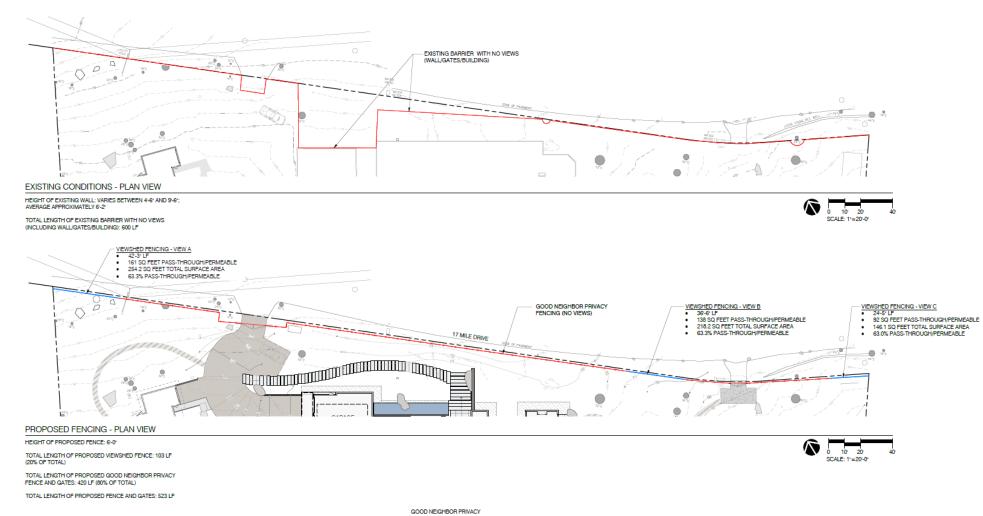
Existing Wall & Proposed Viewshed Fencing Plan (Source IX.1)
